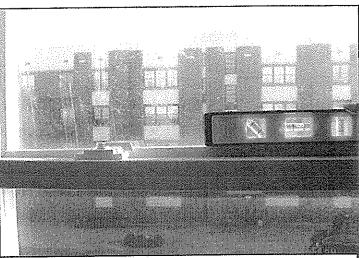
Rear exterior fasteners are tight to siding. No room for expansion and contraction.
